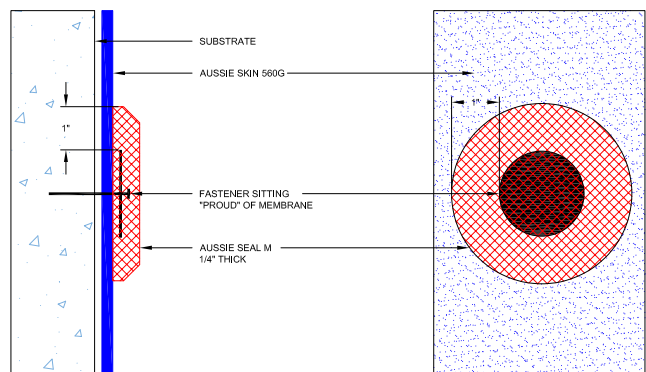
NON-FLUSH FASTENER DETAIL
